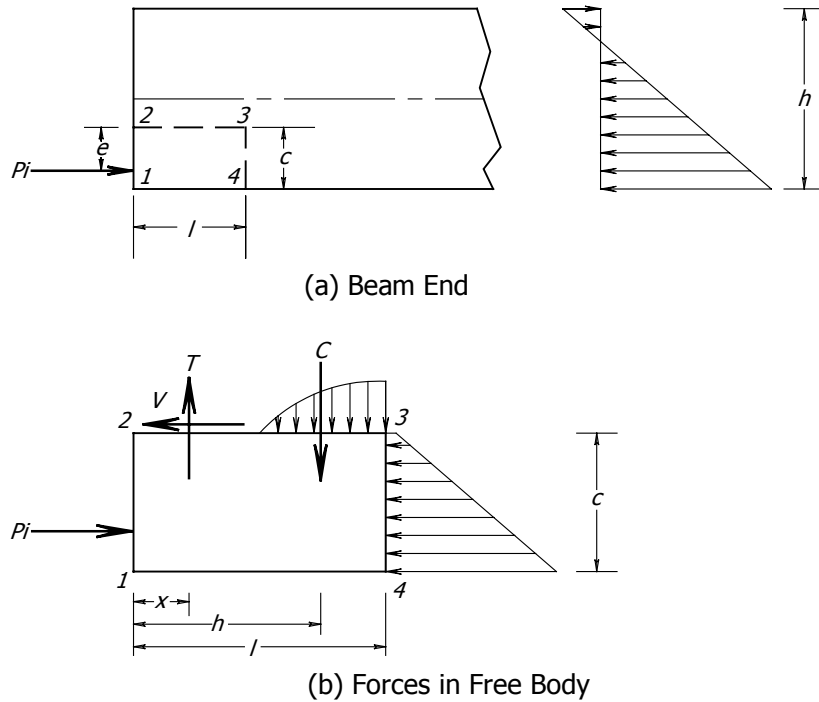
ANCHORAGE ZONE ANALYSIS OF PRESTRESSED CONCRETE BODY
